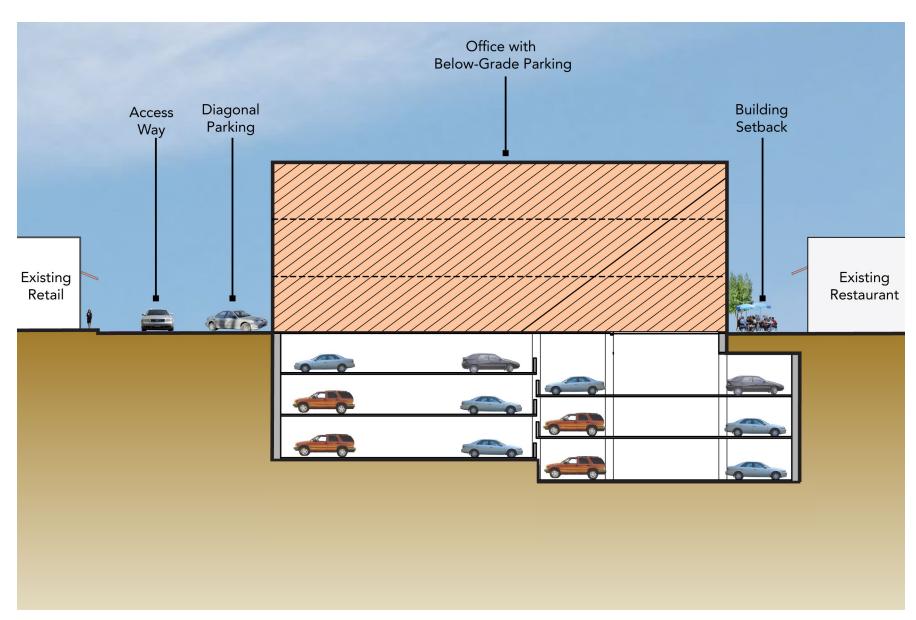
Public-Private Test Case C—Cross-Section of Office Building with Below-Grade Parking, Plaza 3 Shown
